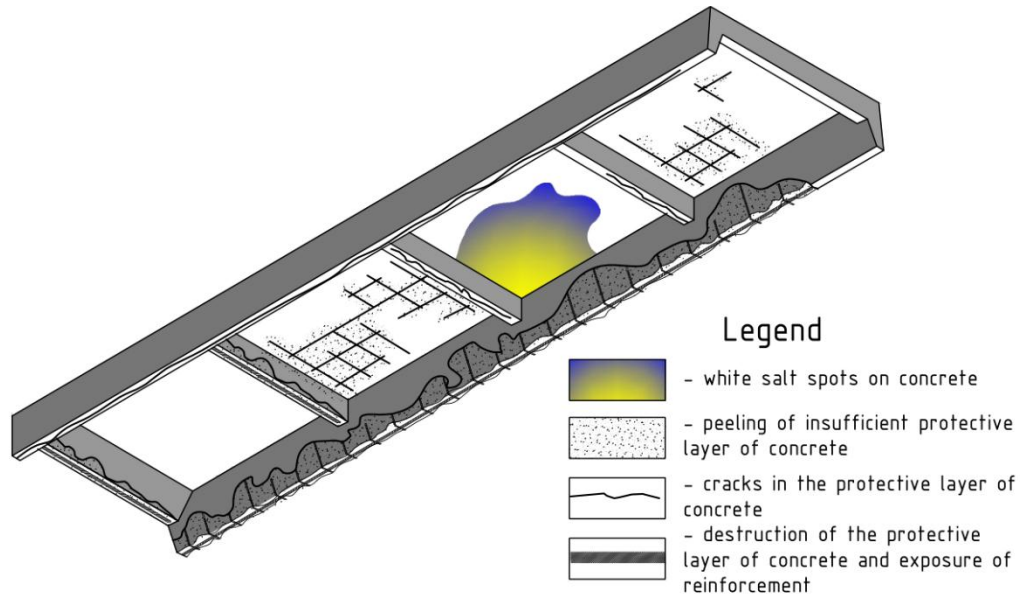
Scheme of characteristic damages of reinforced concrete structures of a covering during operation.
